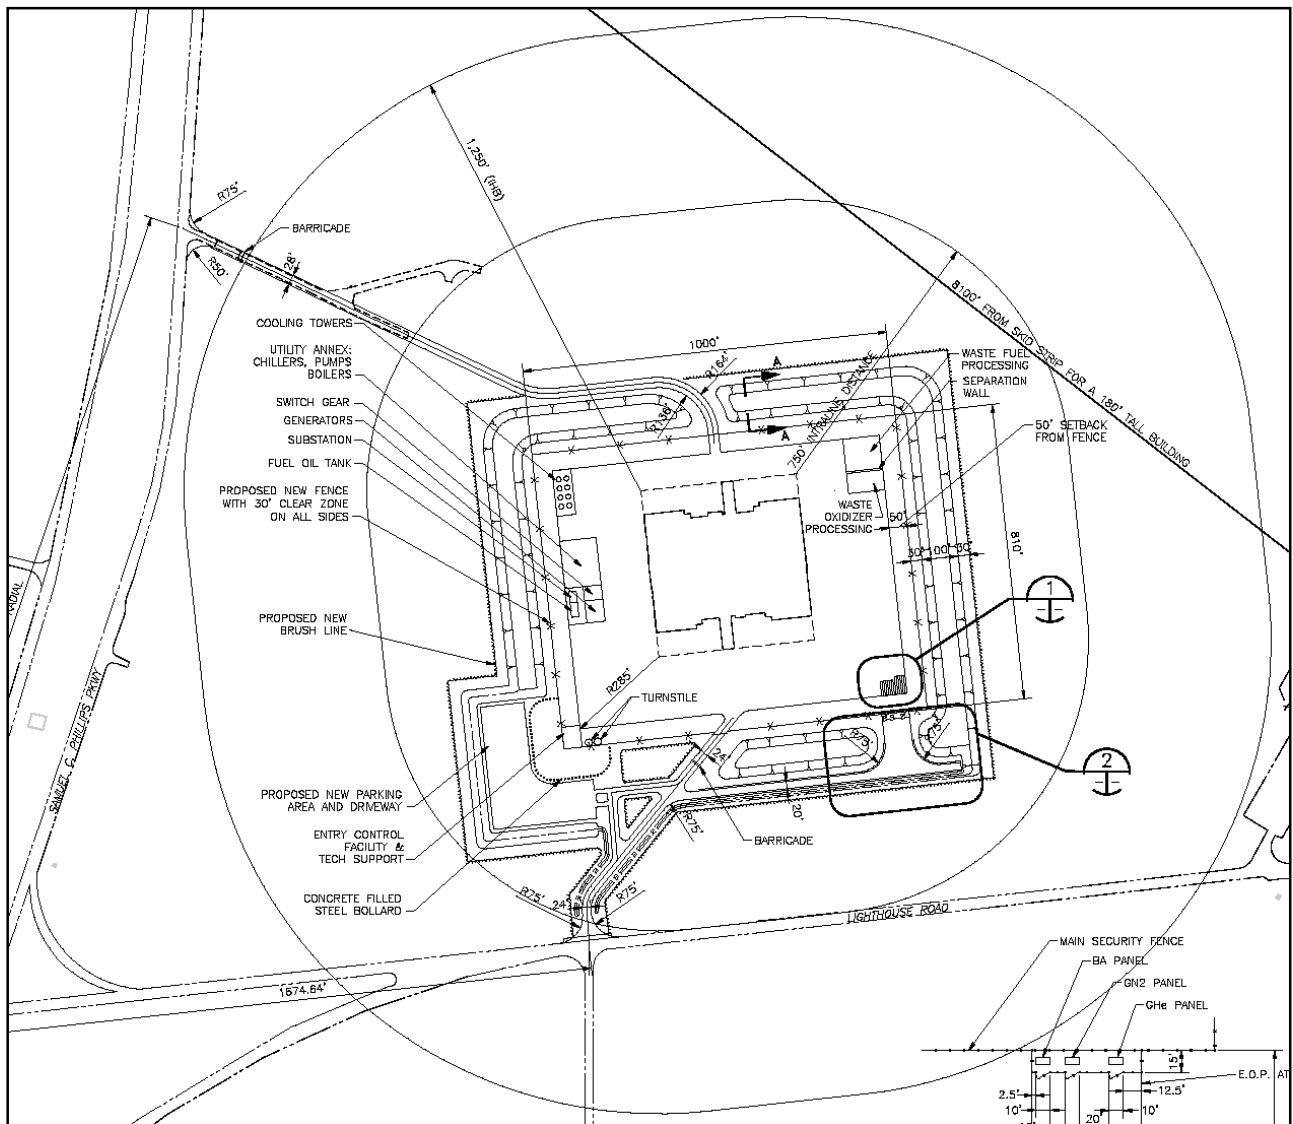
Layout of the proposed NRO EPF under the Proposed Action.
